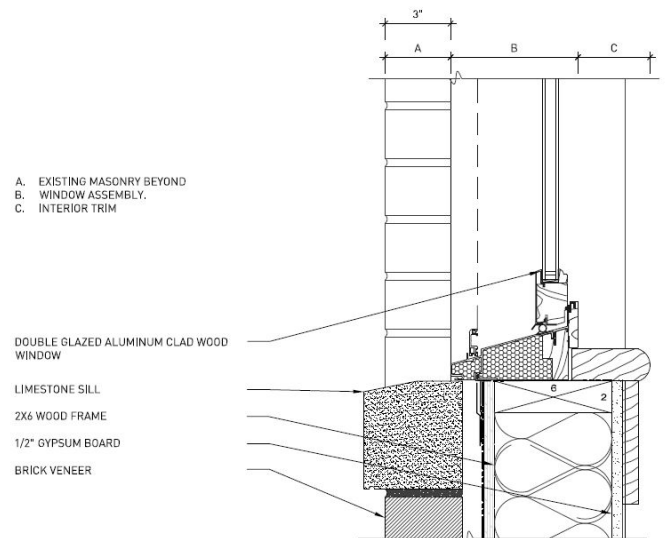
, by Applicant 2023: Window sill detail, showing 3” recessed inset from exterior wall.
